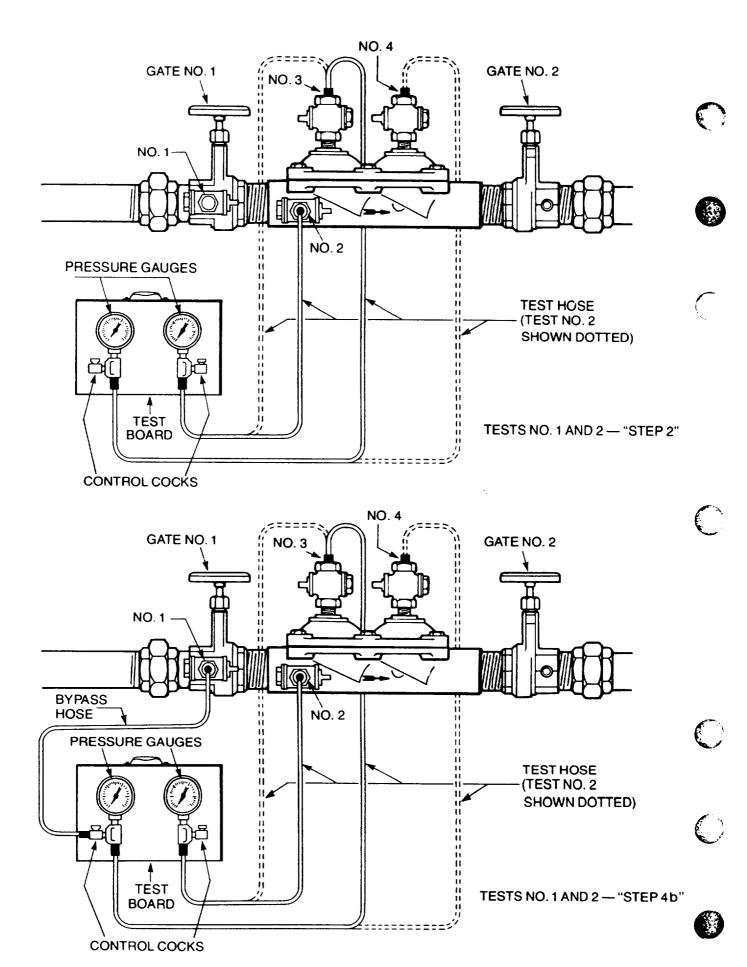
PRESSURE GAUGES INSTALLED ON FDC DOUBLE CHECK VALVE ASSEMBLY
